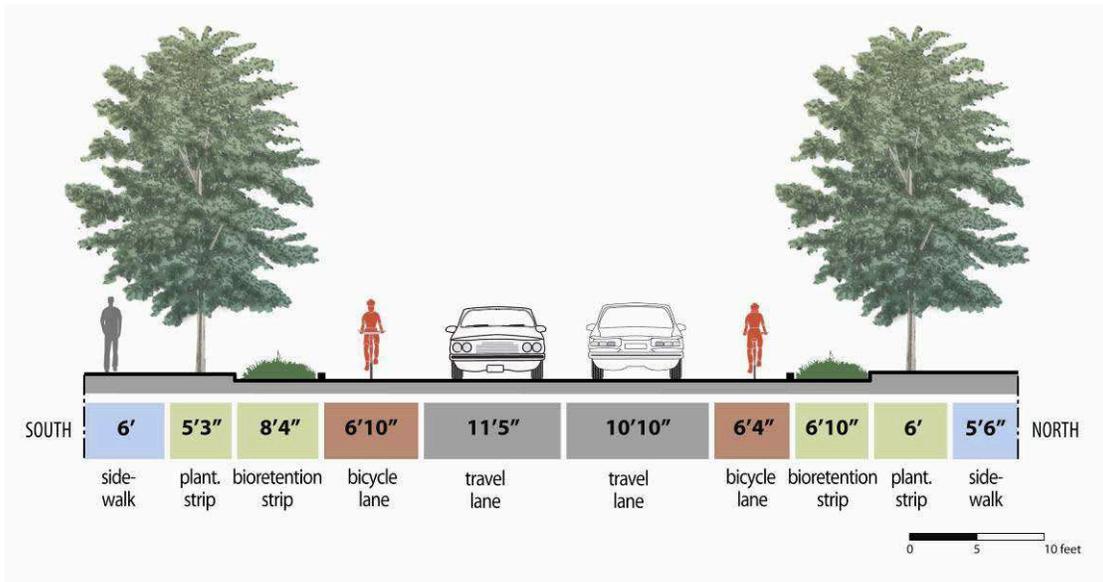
Center Boulevard (Pacheco Avenue to Pastori Avenue) (Fairfax)
